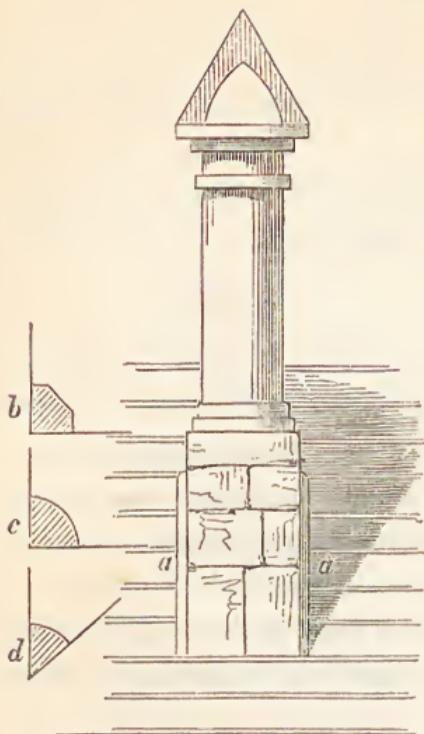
Elevation of a chimney-shaft, showing tile angle fillets.
